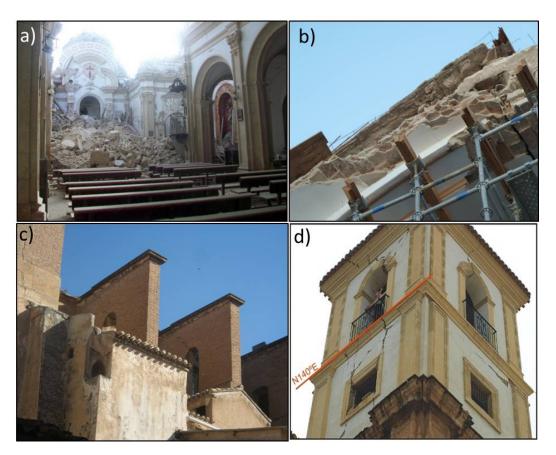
Damages to the Church of Santiago. a) Transept collapse; b) Detail of the RC compression layer of the roof; c) Damages to the buttresses; d) Damages and tower orientation (IGME, 2011)
